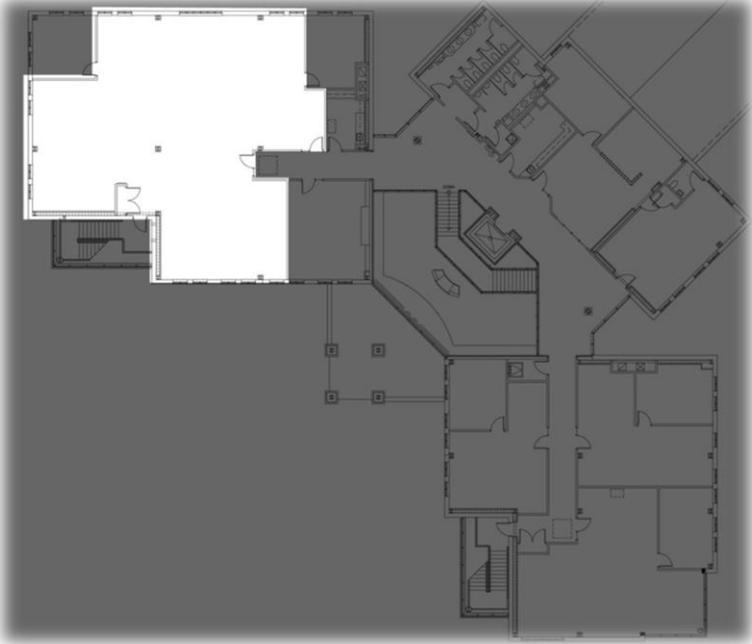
Second Floor Plan, Planning and Engineering Large Work Space
